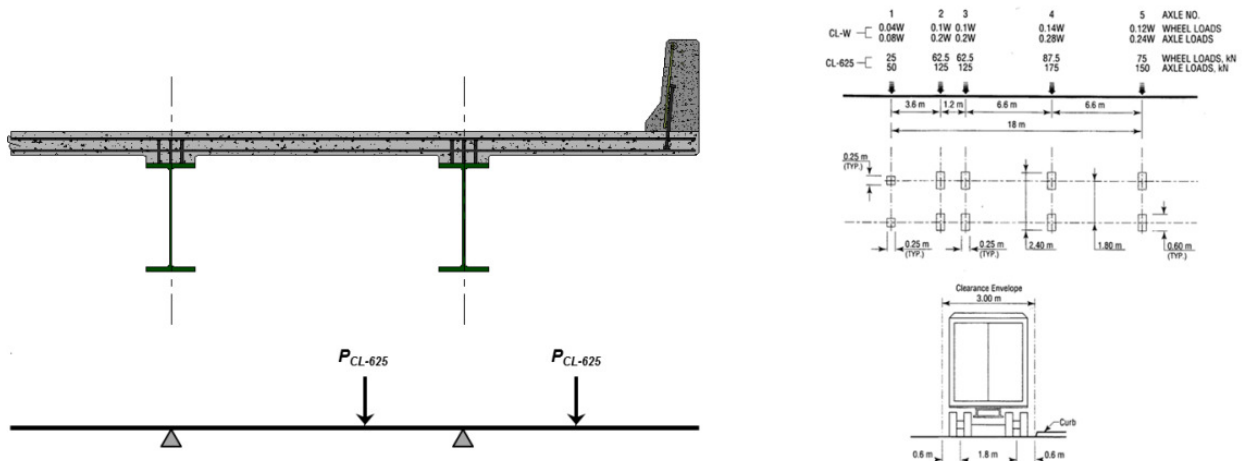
Schematic of the CL-625 design truck for the design of a bridge deck cantilever slab overhang
